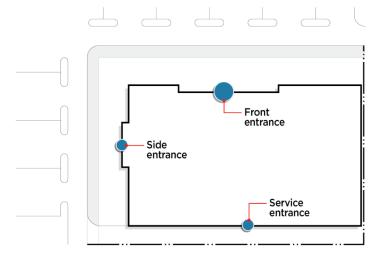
Large Lot Commercial Building Type with Detached Outlot/Liner Commercial Building Type Building Entrance
